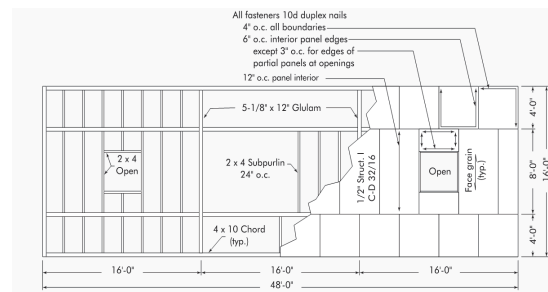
APA Report 138 Diaphragm Construction Details, Diaphragm 3 [7]
